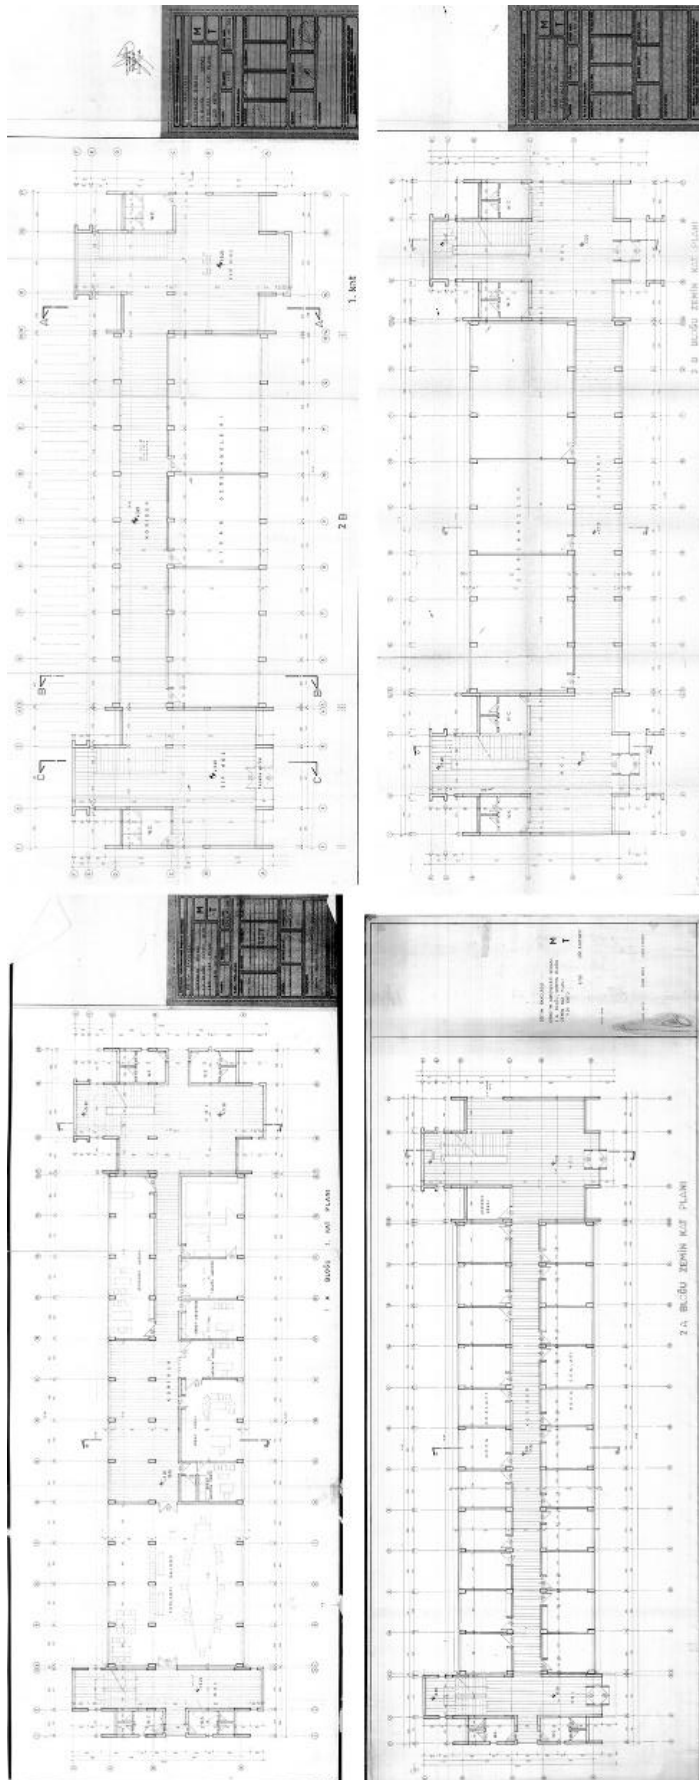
Original plans of the first floor of the Block 1A, the ground floor plan of the Block 2A, the first floor of the Block 2B and the ground floor plan of the Block 3B in the Faculty of Educational Sciences (archive of Ankara University Directorate of Construction and Technical Works)
